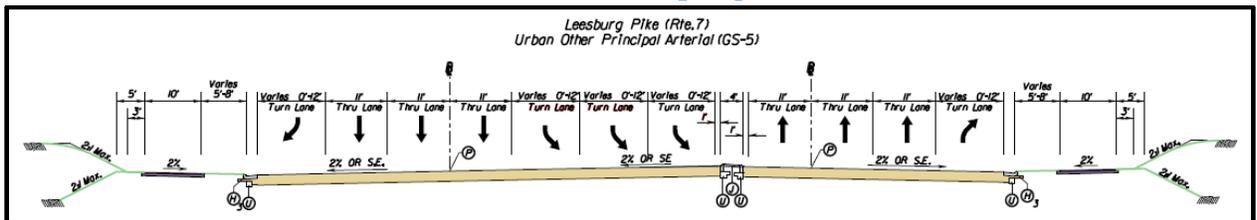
Revised Typical Section of the At-grade Intersection of Route 7 at Baron Cameron Ave / Springvale Road
